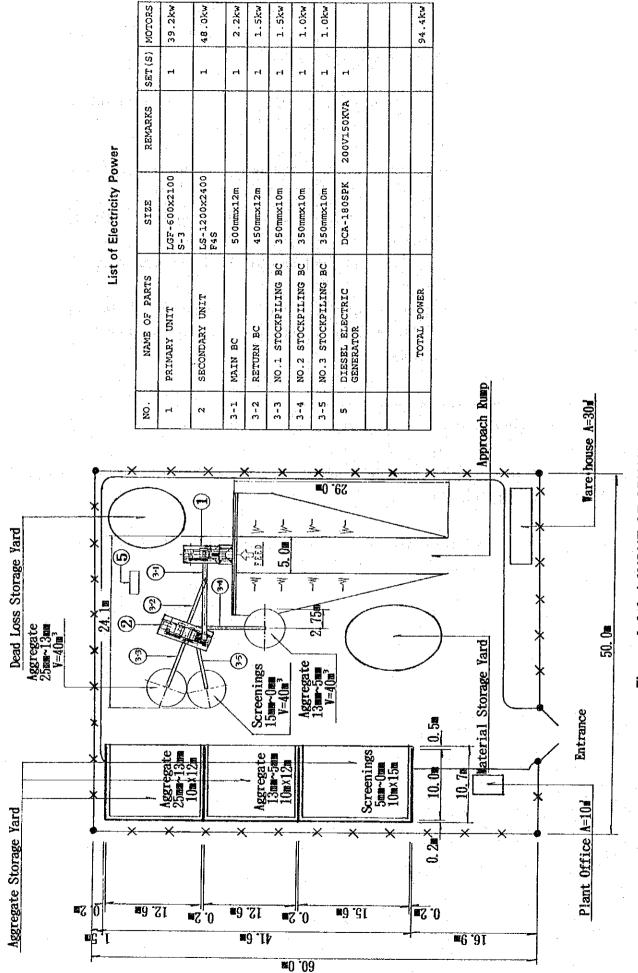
LAYOUT OF CRUSHING AND SCREENING PLANT
